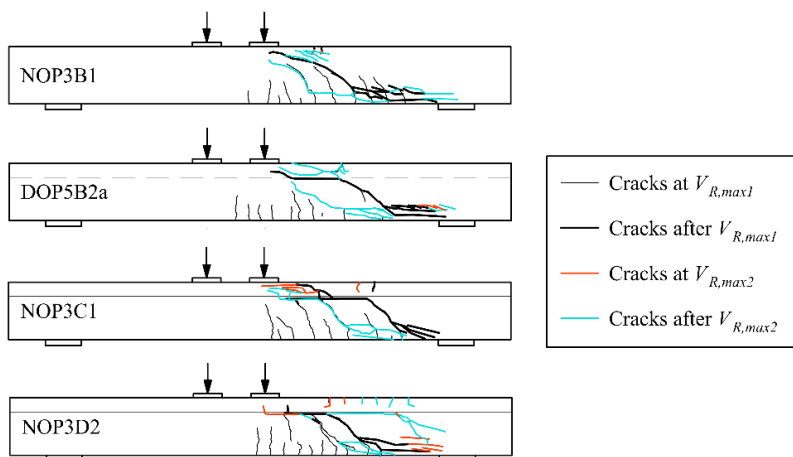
Examples of crack patterns of beams without web reinforcement.
